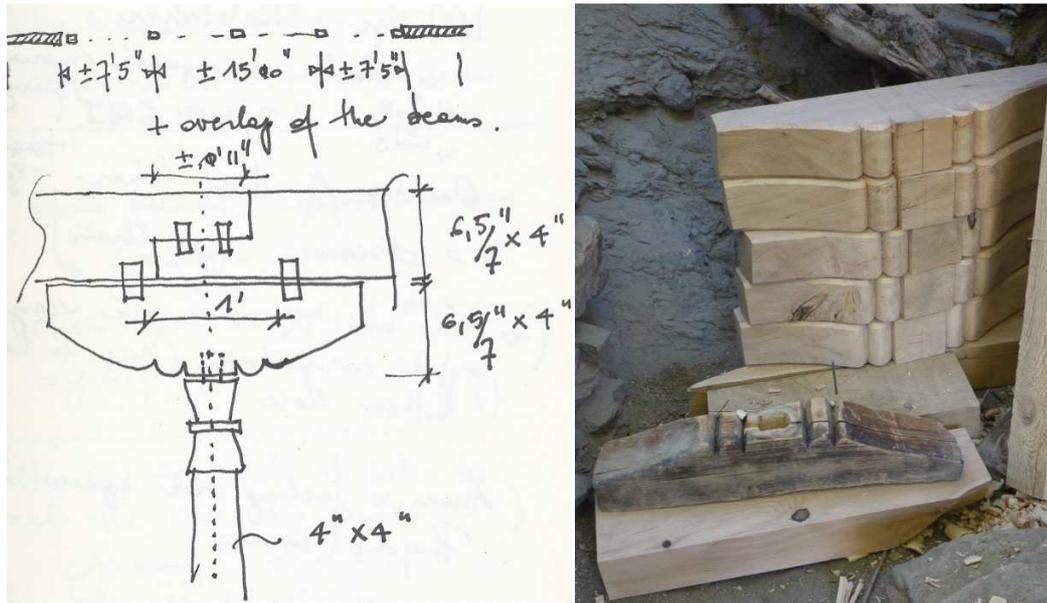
Sketch of the new structures. (photo: Hilde Vets)
